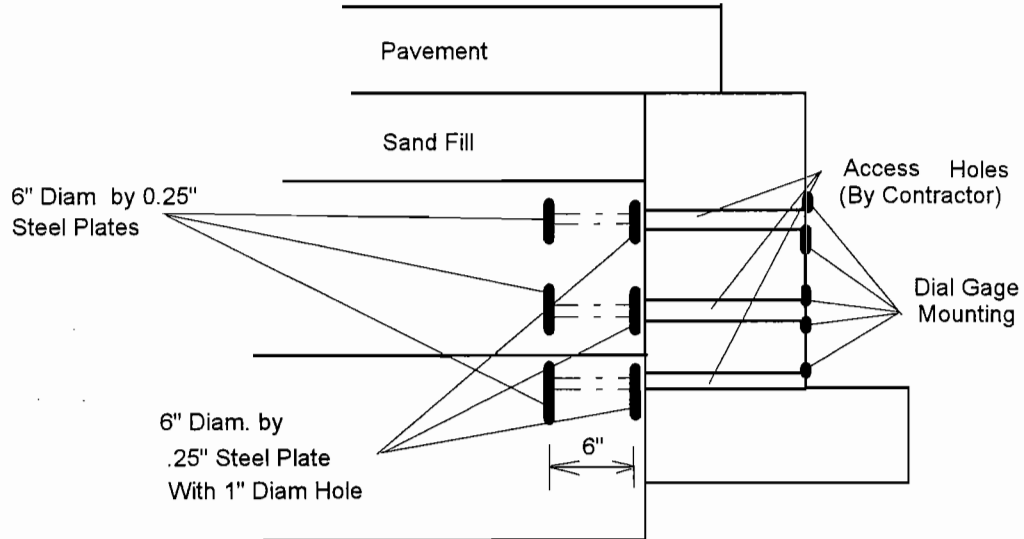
DETAIL OF ABUTMENT INSTRUMENTATION
